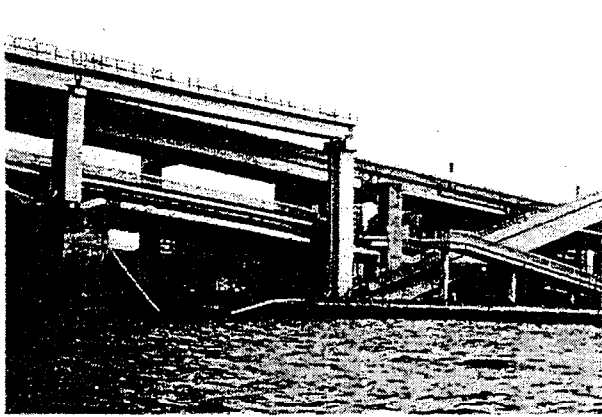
Bridge girder dropped due to ground displacement (A in Fig. 2)
